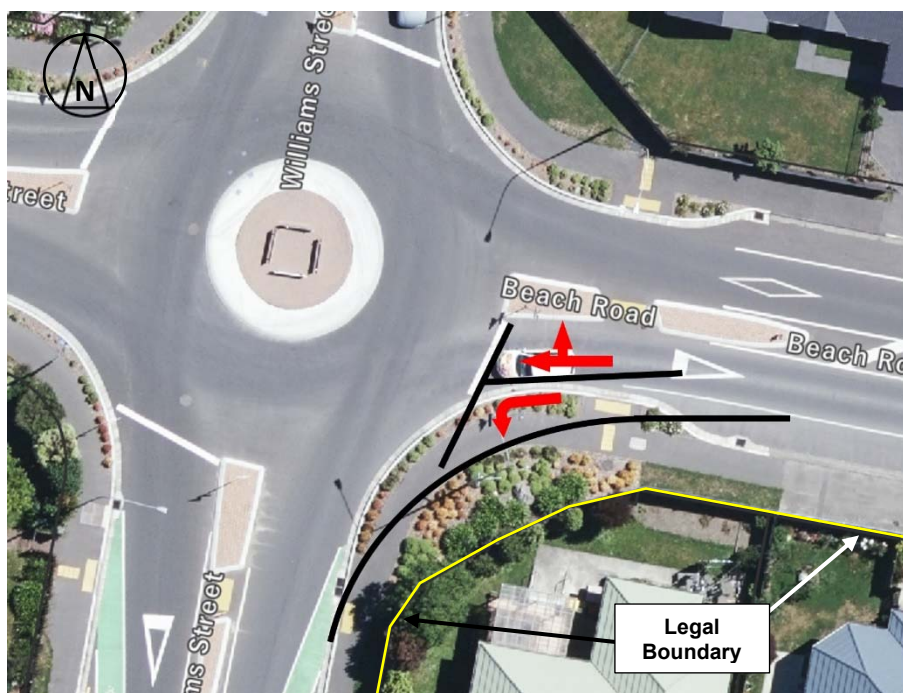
Conceptual Layout for Second Traffic Lane on Beach Road
